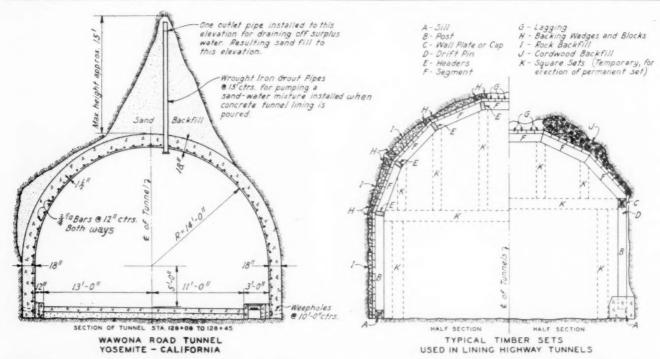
LEFT; Cross Section of Wawona Tunnel, California, Showing Sand Backfill Above Concrete Lining.
